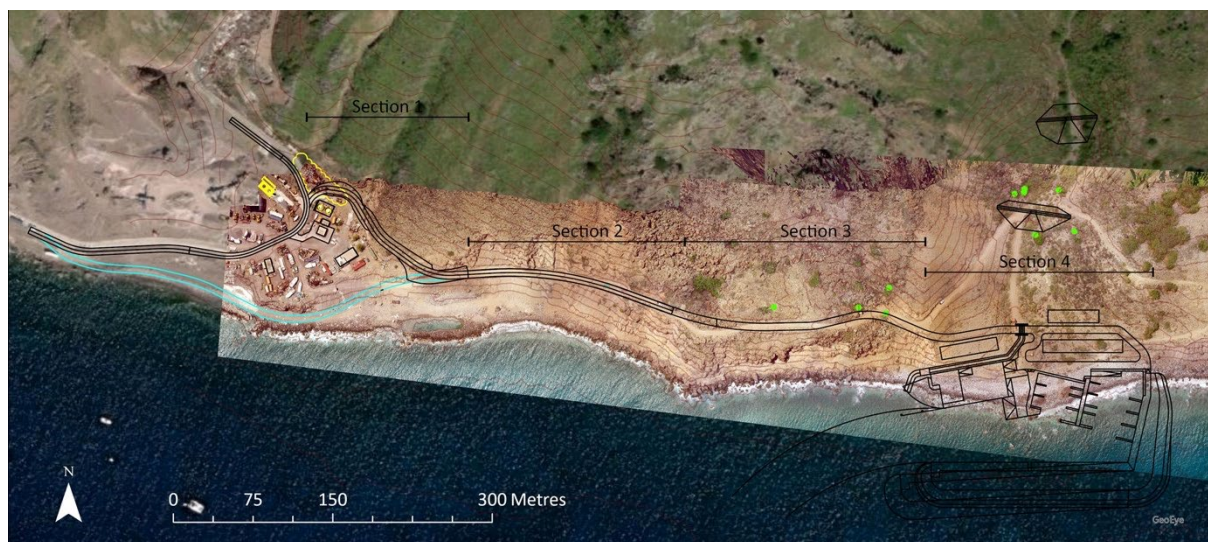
Sections 1-4 of new road. Road indicated in blue is the temporary road. Green dots: mature trees.
